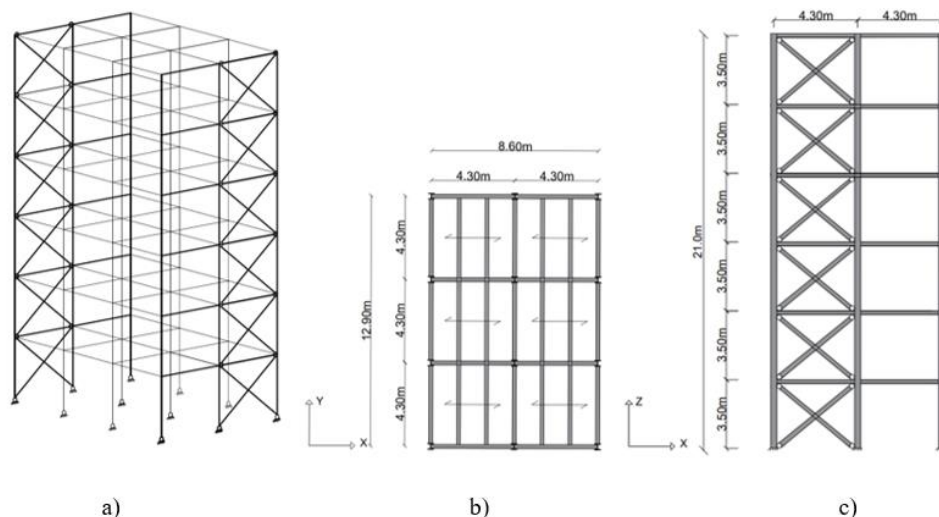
Geometry of case study building: a) 3D view, b) plan and c) front view of the braced frame.
